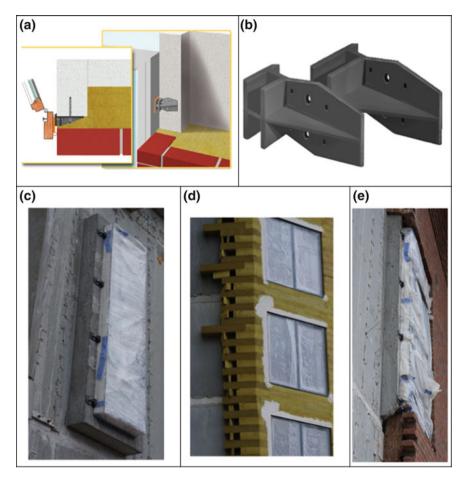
Example of window installation within external insulation: (a) schematics of window mounting using K-MUR bracket; (b) example of brackets for window mounting outside the wall; plastic brackets K-WALL-28/50 reduce thermal bridging and have a load capacity of 120 kg per mounting; (c) window is installed outside the wall using brackets; (d) mineral wool insulation is installed using adhesive compound; (e) insulation is covered with brick; a and b graphs are provided by Knudsen Killen A/S; c, d and e – pictures taken by Alexander Zhivov at different construction sites in Aalborg, Denmark
